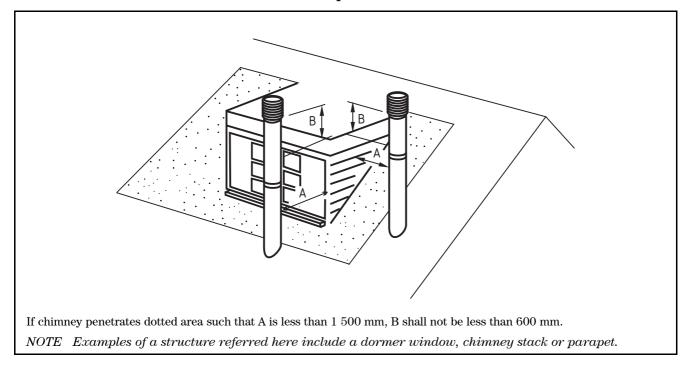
Open flue or room-sealed, natural or fanned draught chimney outlet locations adjacent to windows or openings on pitched roofs
